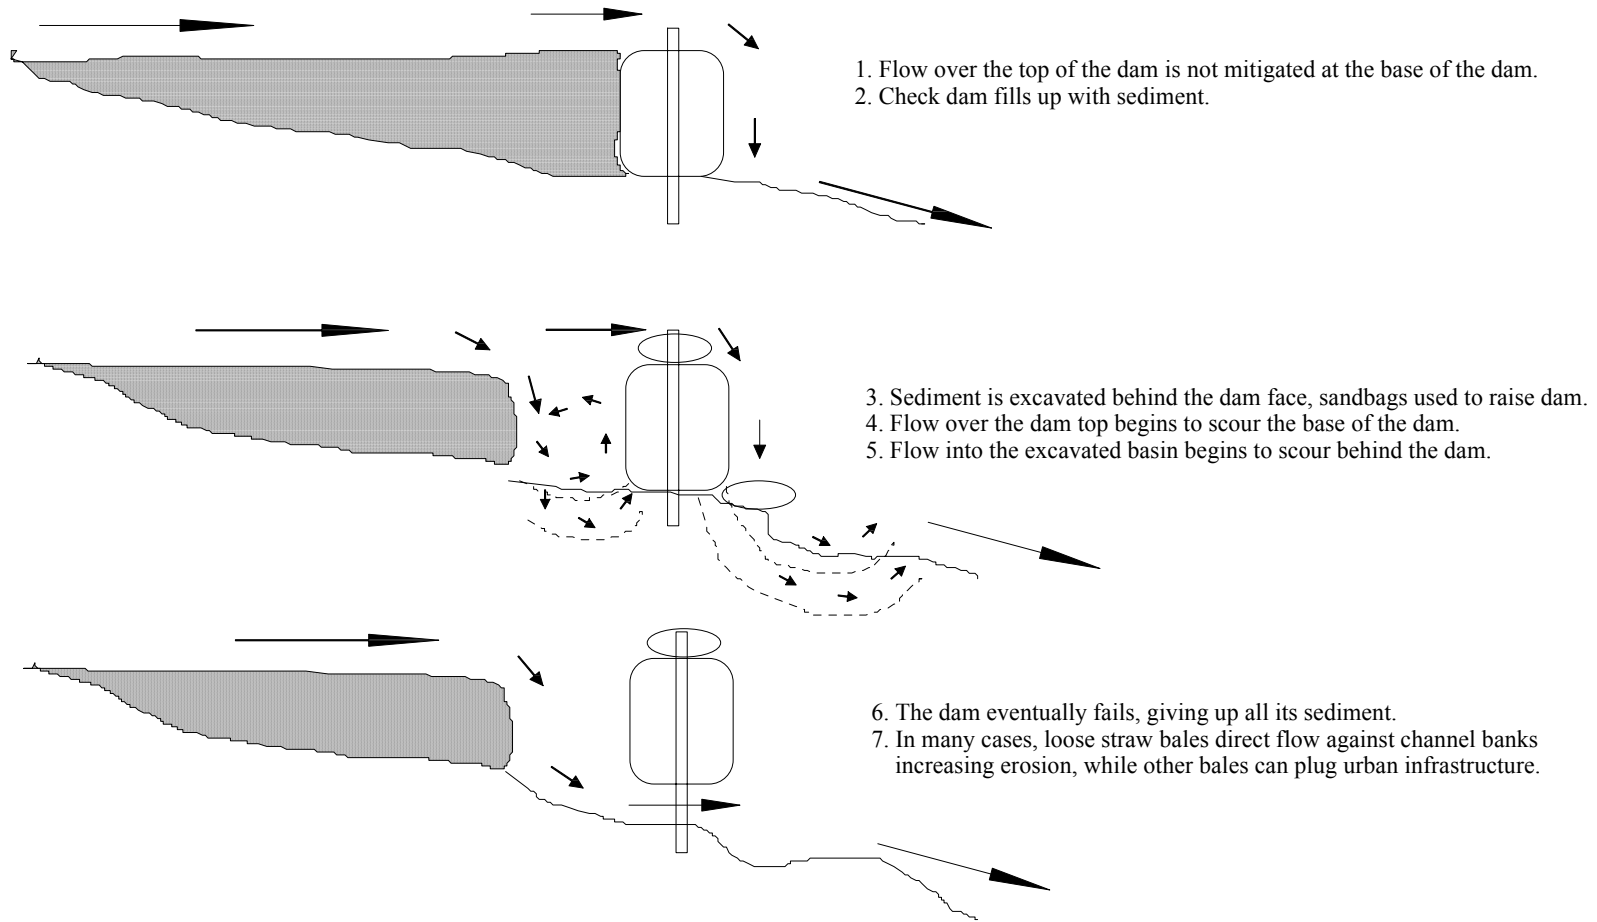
Excavation of Straw Bale Check Dam Leads to Failure
